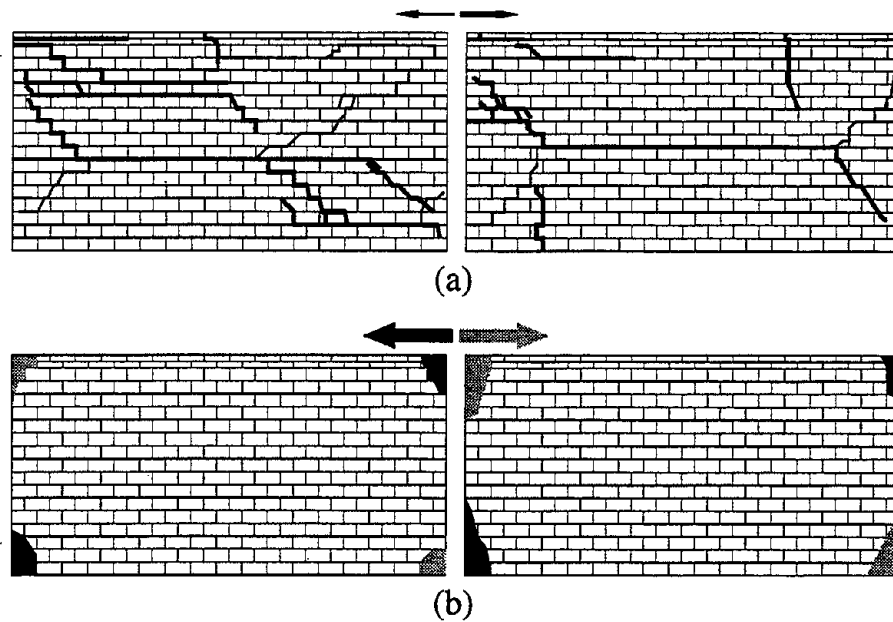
Modes of failure for infill walls; (a) Mortar cracking and joint slip for specimen Q21SSB; (b) Corner crushing for specimen Q21SSA.
